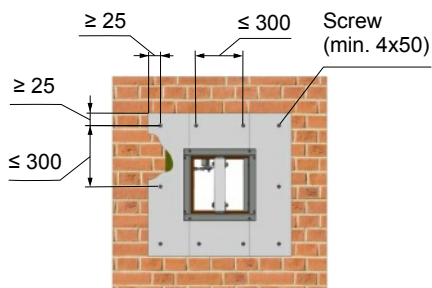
Solid wall construction - stuffing box, fire protection mastic and cement lime plate
